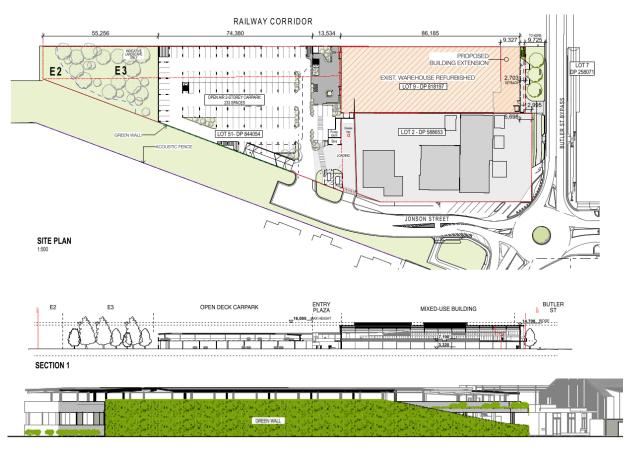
Approved Site Plan and Section/Elevation to Jonson St
